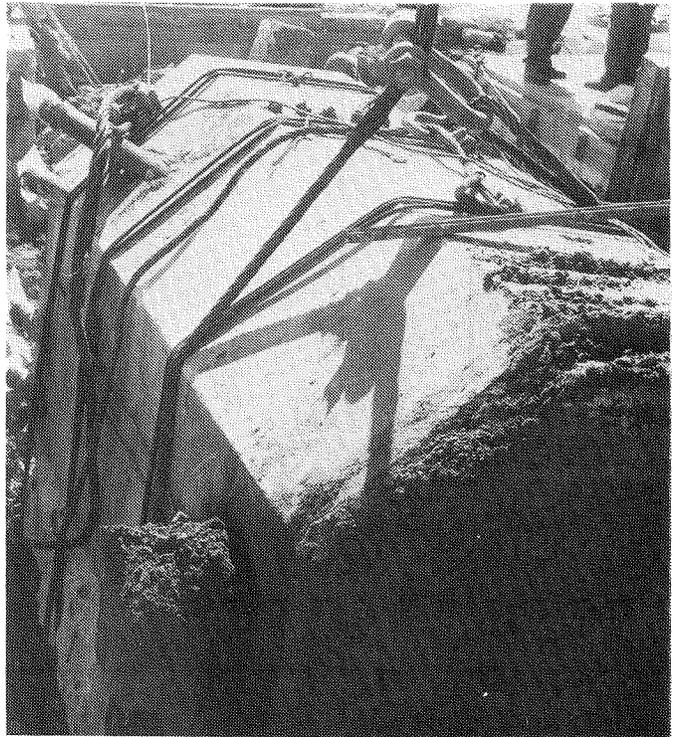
Reactor Containment Vessel and Shield Ready To Be Removed in One Piece
